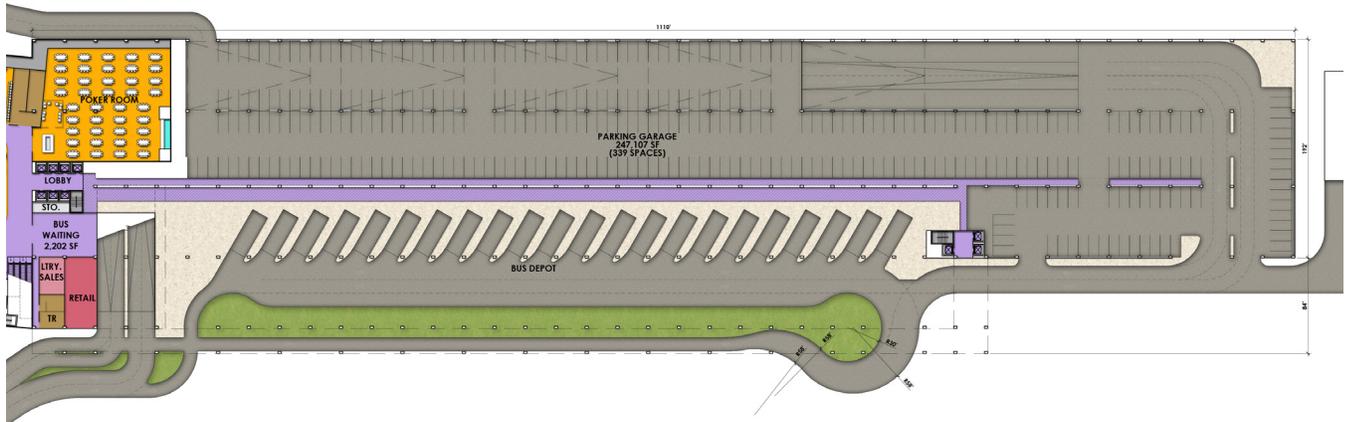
a-32 Plans for Parking Structures - Garage Grade Level 1 Plan
